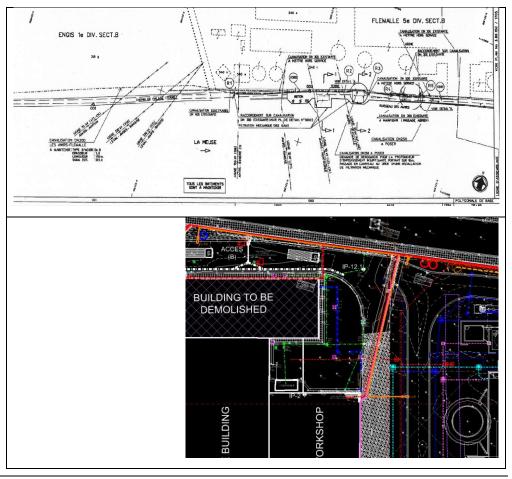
Site lay-out plan of the high-pressure gas pipe at the quay wall of the river Meuse/Maas.
